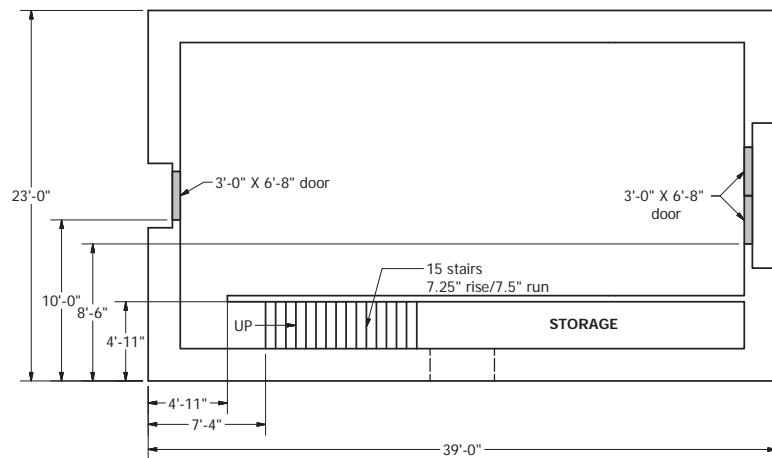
Delaware County, PA Fire Test Structure First Floor
